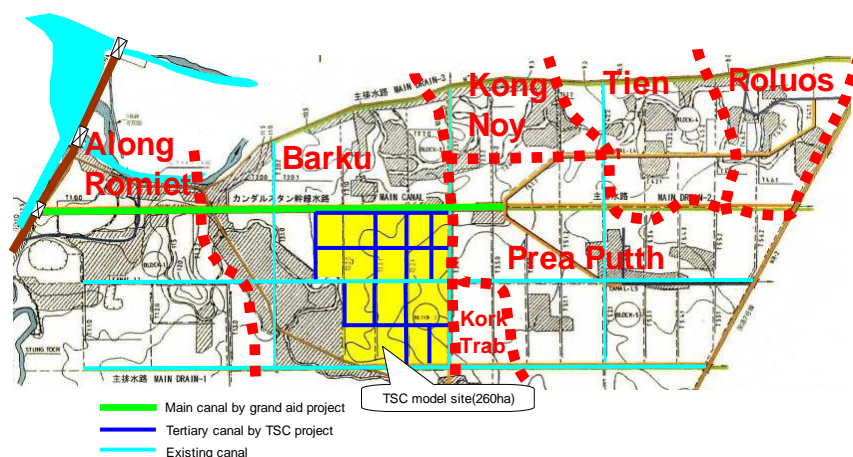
Ground-plan of the Kandal Stung Irrigation Project area
